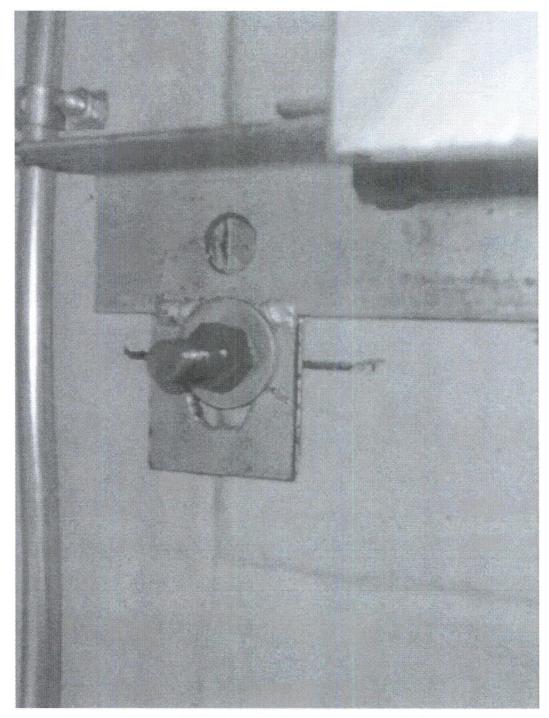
Reduced Anchor Bolt Spacing (Room C-027)
